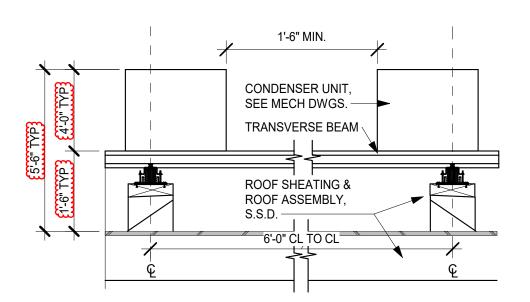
DETAILS ARE TYPICAL, PV PANELS ARE A DEFERRED PERMIT SUBMITAL
